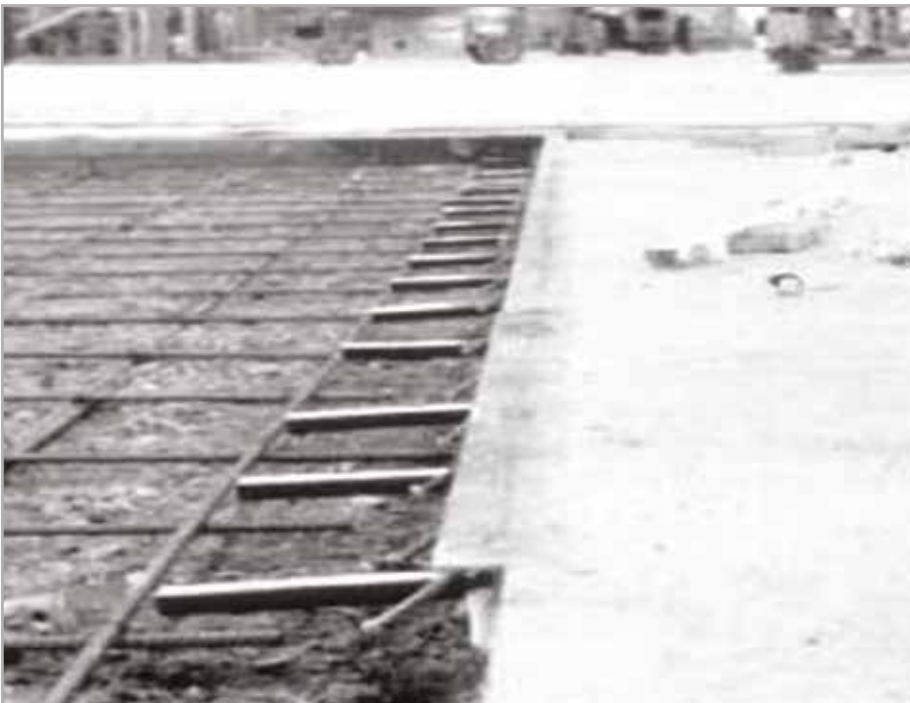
Prefabricated steel angle system for armoring floor construction joints subjected to heavy, frequent vehicle loads. For economy, armor system is located only where traffic will be. Note: square dowels with special clips (red) having cushioning side pads to allow differential horizontal movements but transfer vertical loads.
